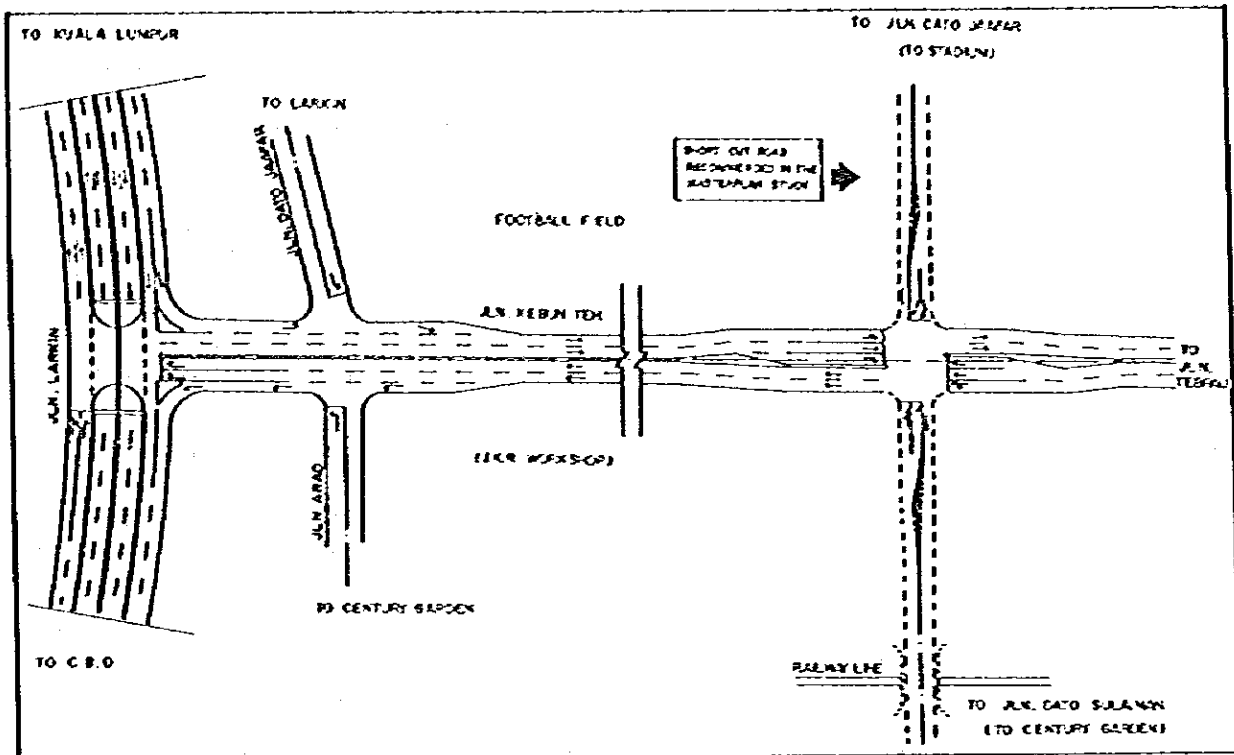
INTERSECTION IMPROVEMENT PLAN AT THE INTERSECTIONS OF JLN KEBUN TEH WITH JLN LARKIN AND JLN ABAD (PLAN 'A')
